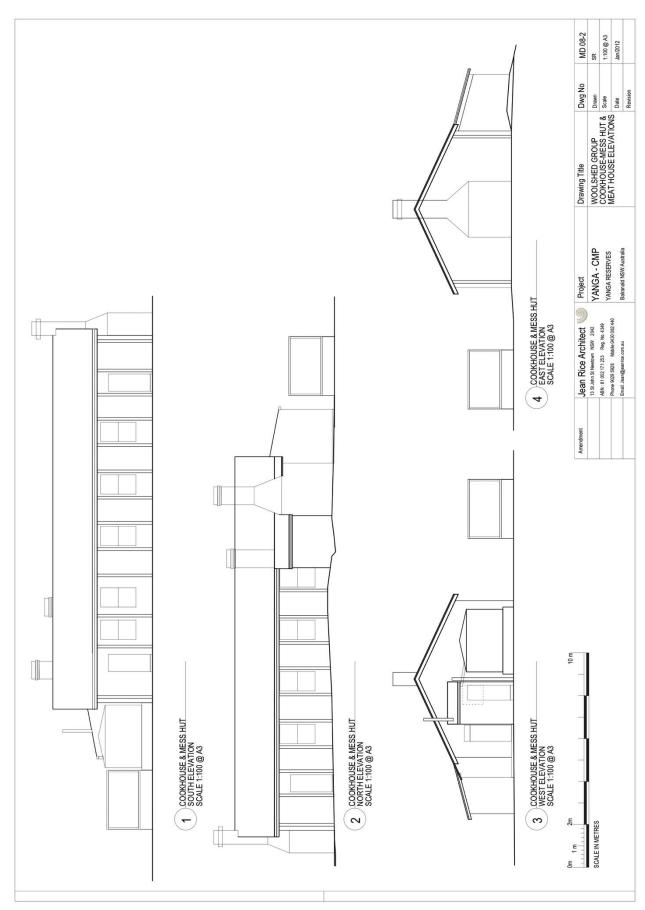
Woolshed Group Cookhouse elevations. Jean Rice Architect, site assessment 2009.
